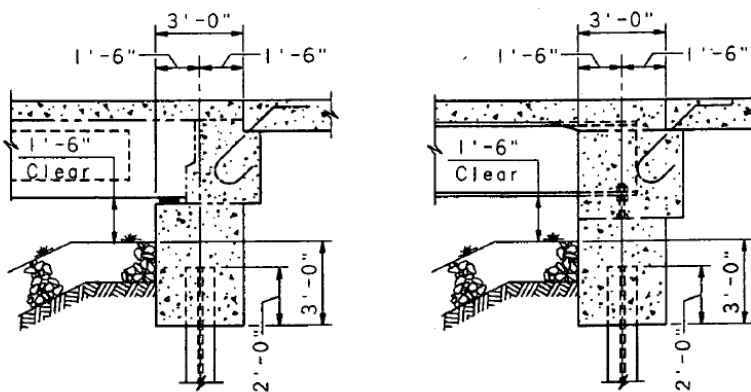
Capped-pile stub-type abutment: (left) for prestressed concrete box-beam stringers, (right) for steel I beam stringers. Source: Burke (1993)
